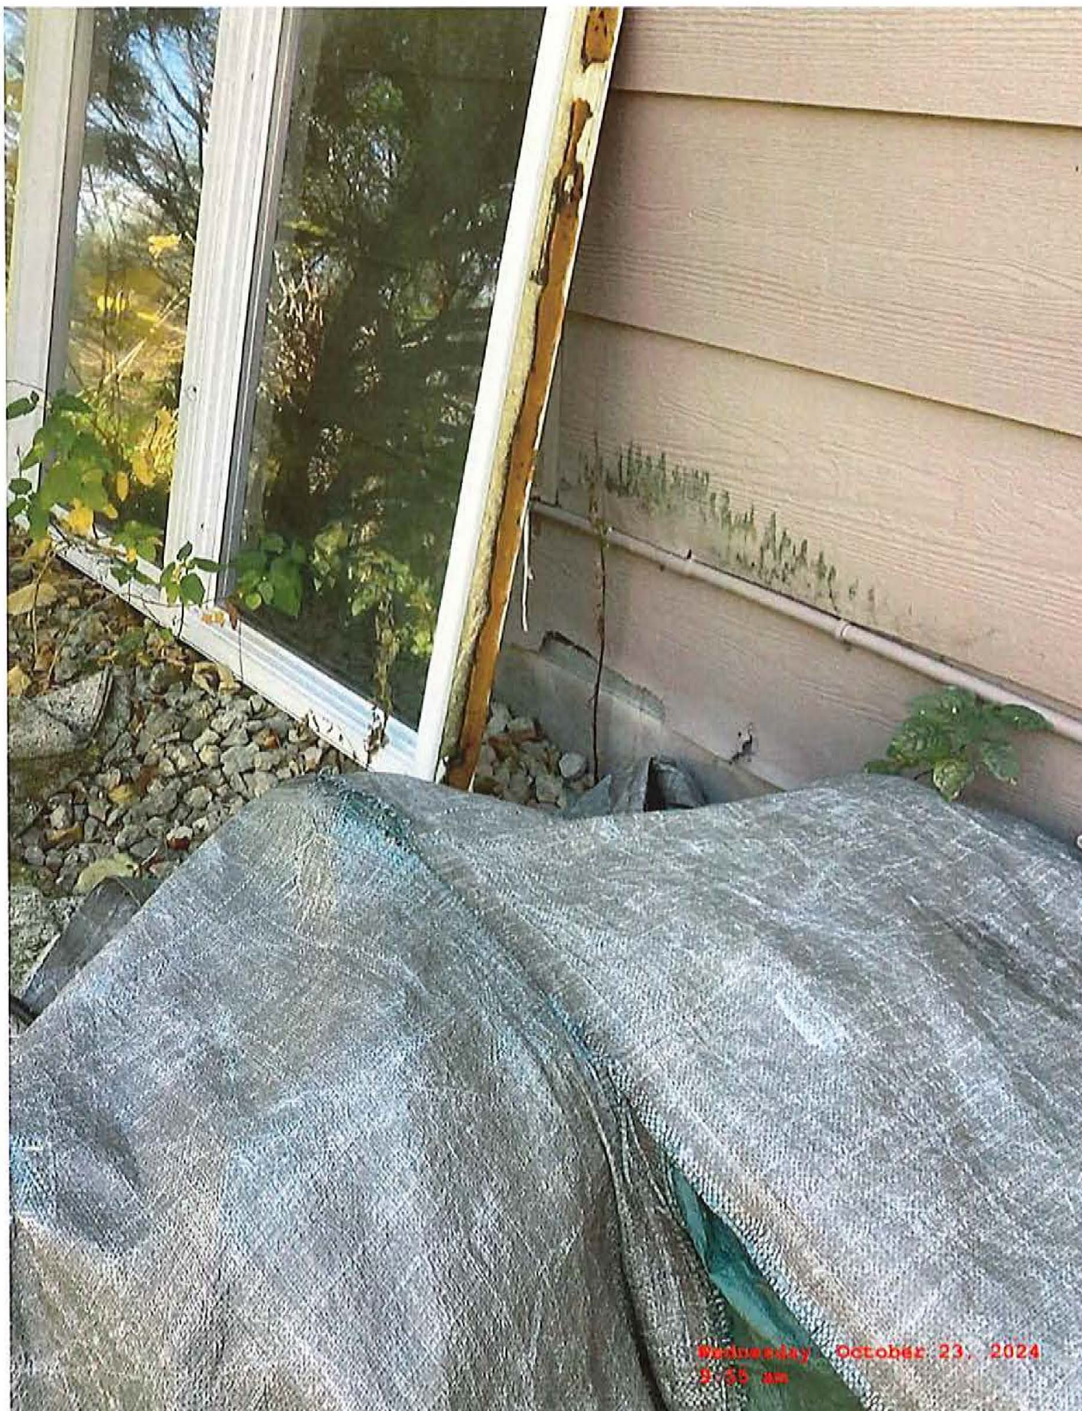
NORTH SIDE OF DWELLING-HOLES IN SIDING, MISSING SIDING JOINT SPLICES
